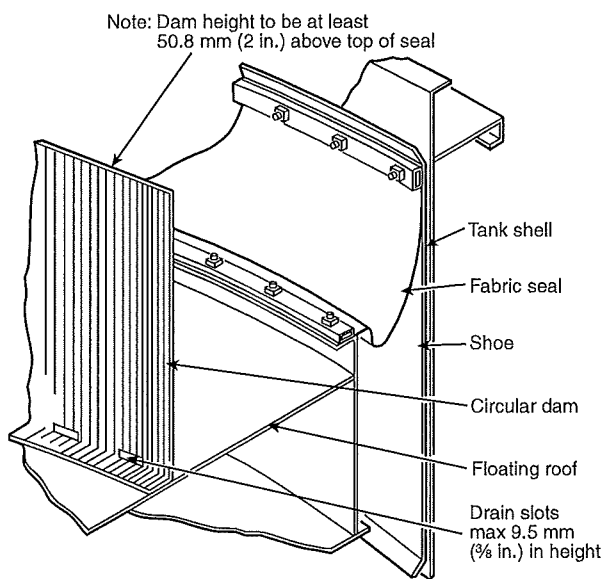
Typical Foam Dam for Floating Roof Tank Protection.
